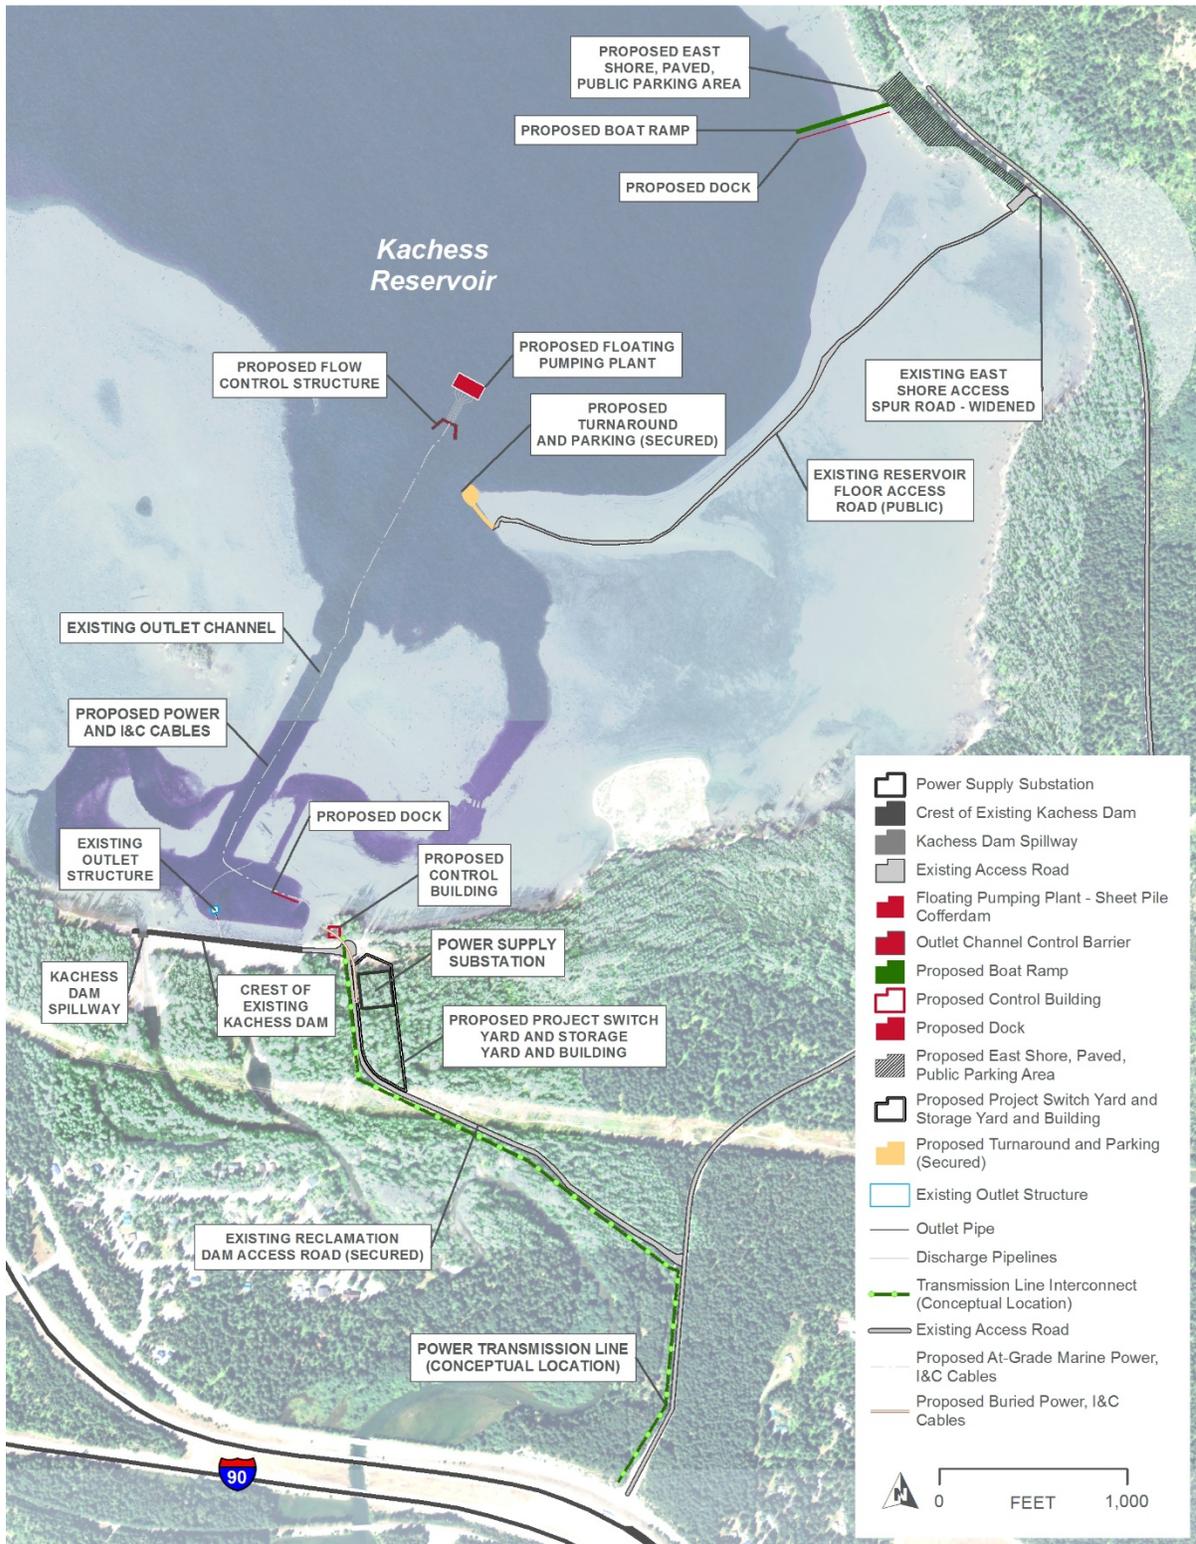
Alternative 4 – KDRPP Floating Pumping Plant Overview
